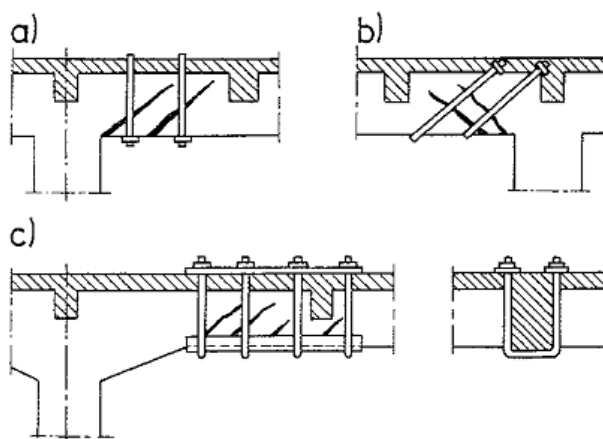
Example of a concrete beam with additional shear reinforcement [19].
